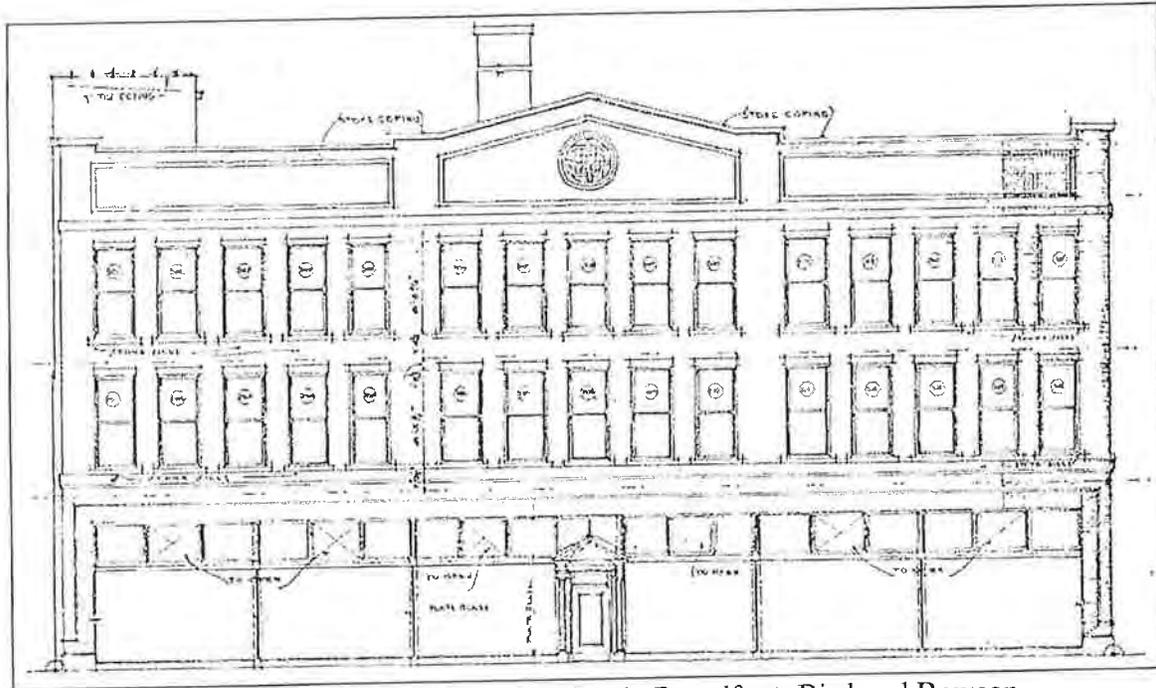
Architects' elevation sketch, Proudfoot, Bird and Rawson
